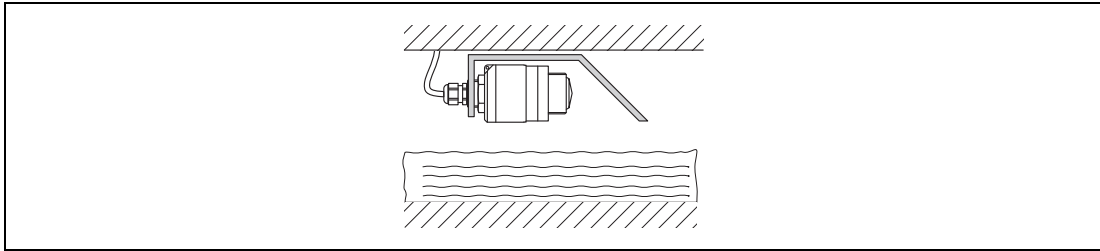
Installation of horizontal mounting bracket for sewer shafts
